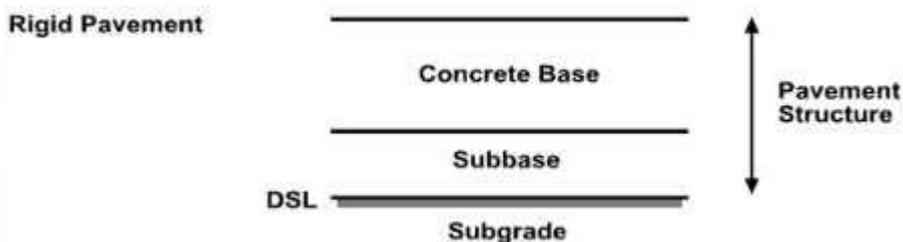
Components of rigid road pavement structure (Source: Austroads 2023)
